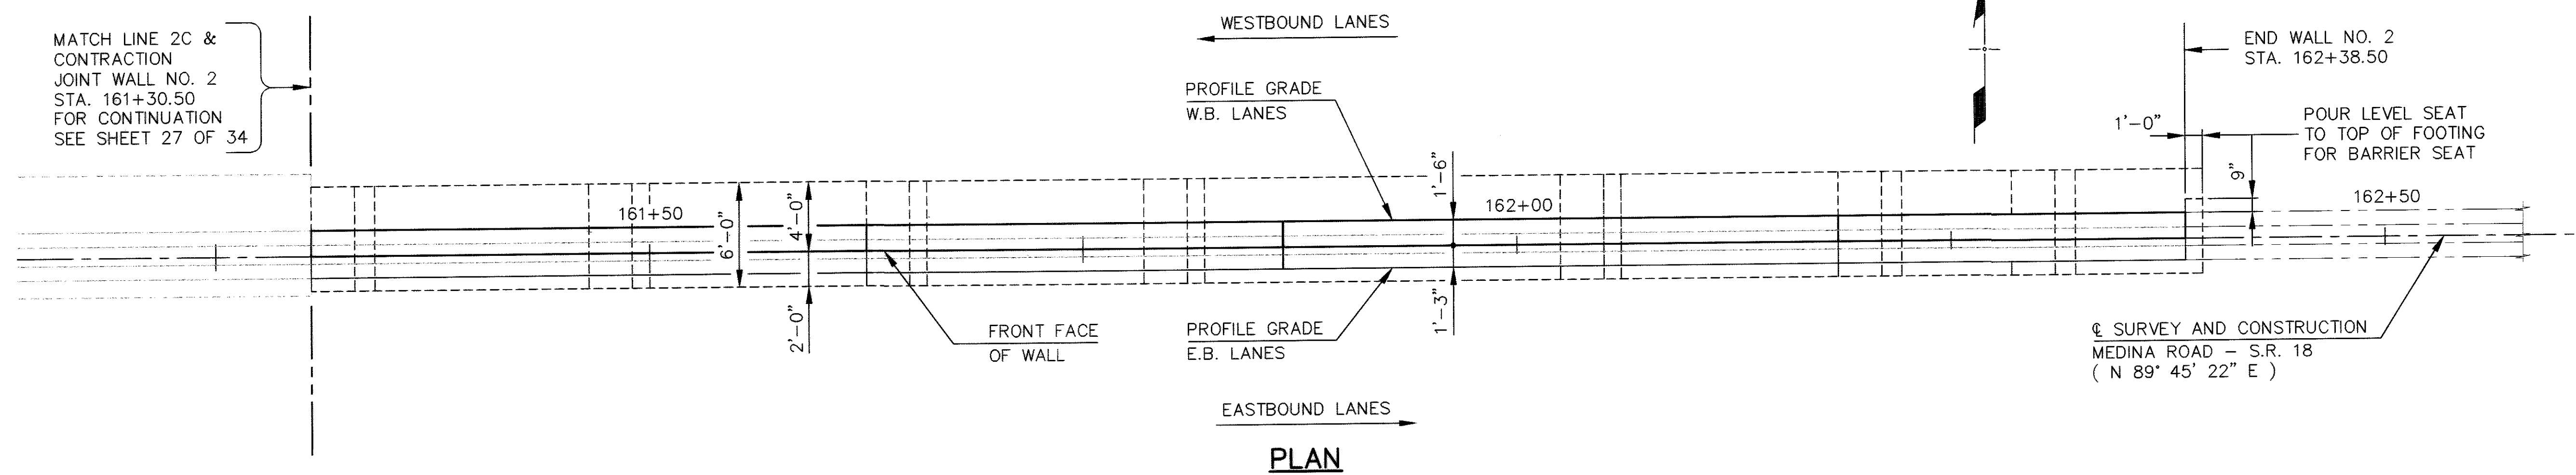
(PANELS W2-14 THRU W2-17)
